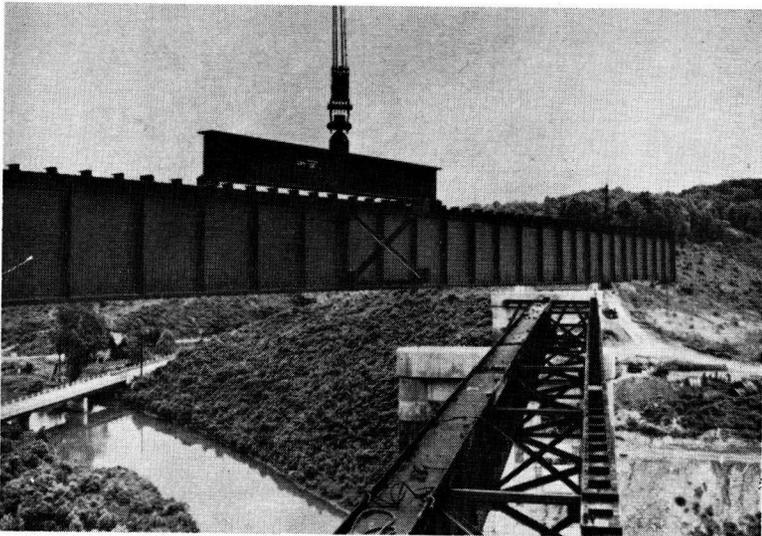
Girder braced with beam bolted flat. Succeeding girders held by falls until attached by cross-frames to stiffened girder.
